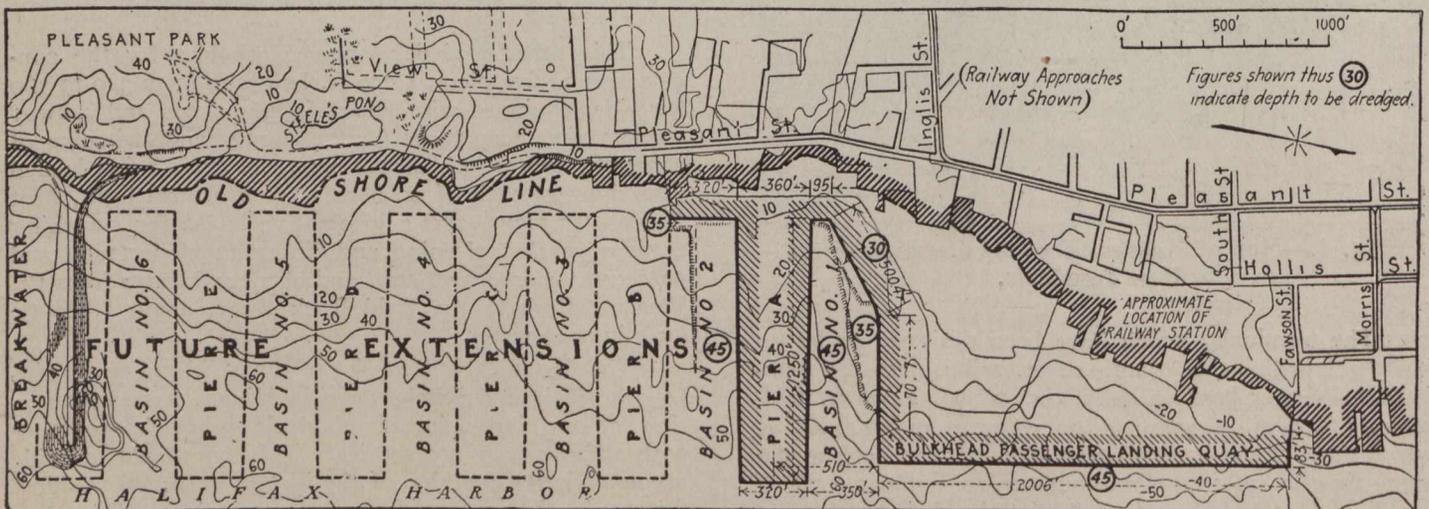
Layout of Quay and Piers and Location of Railway Terminal at Halifax. (Drawing by courtesy Engineering News.)
